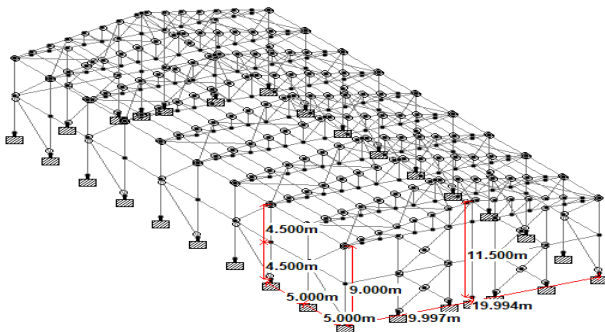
Conventional Steel Building Structure (Diagonal bracing)
